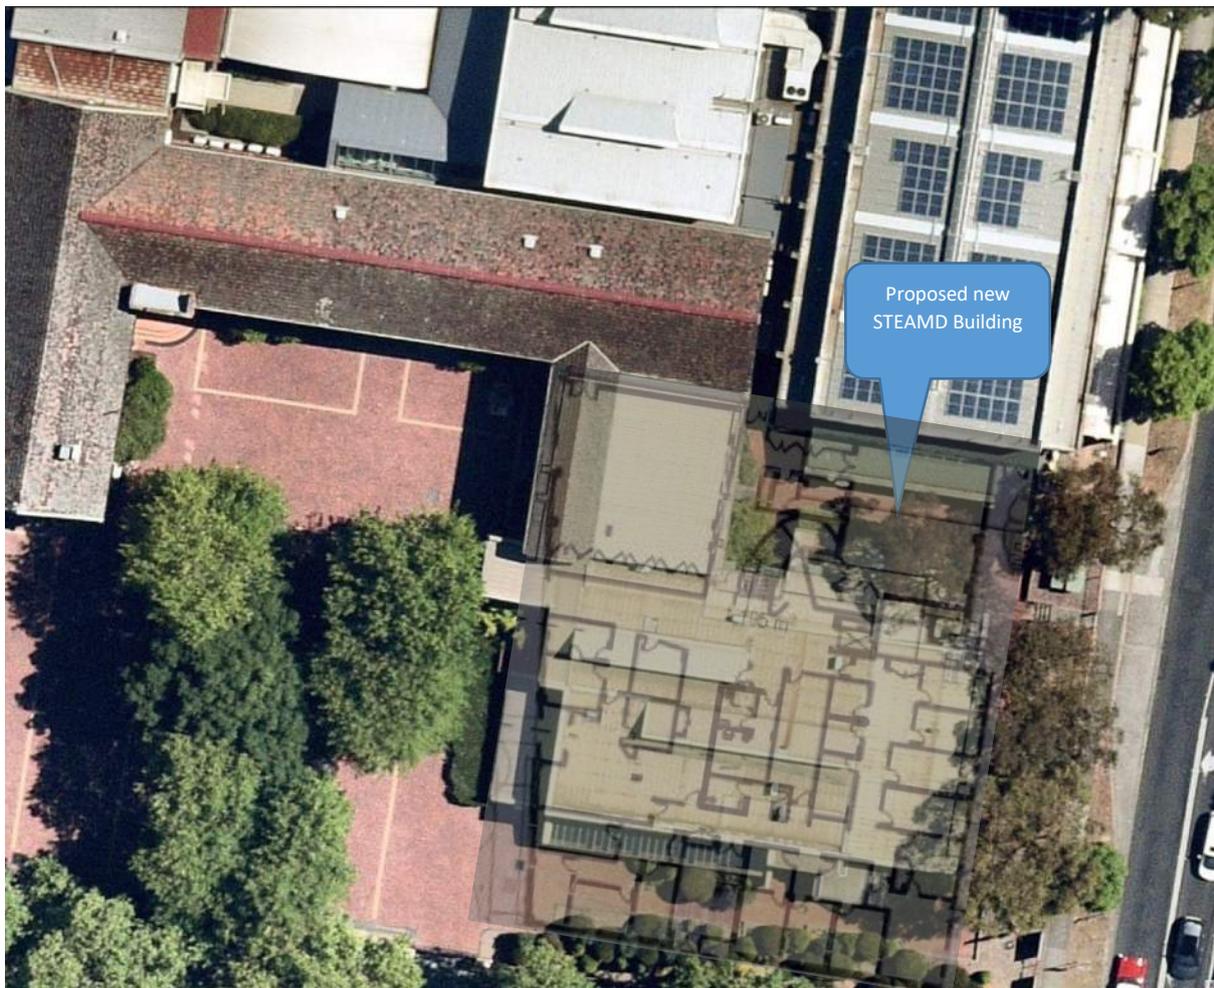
NEARMAP photo of existing site with proposed building superimposed
